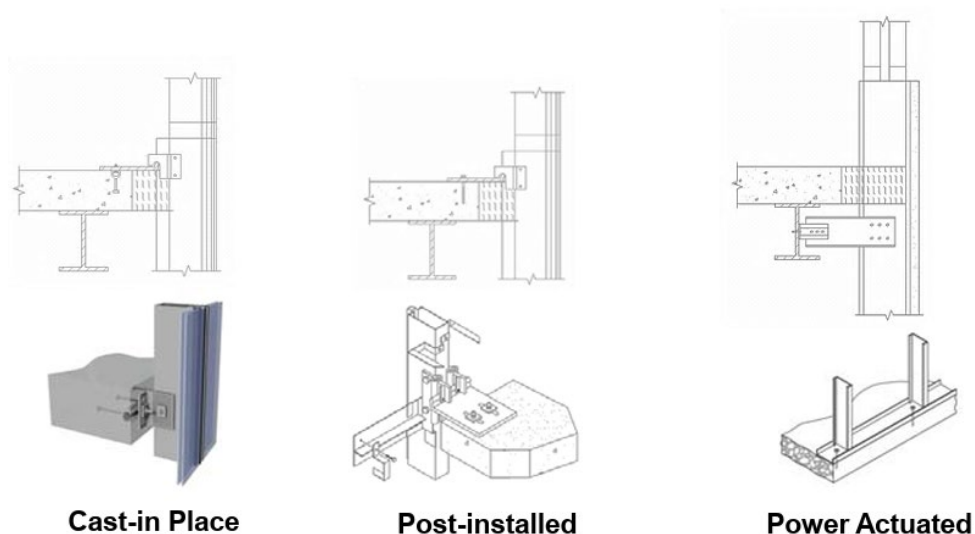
Facade fastening systems in concrete buildings (HILTI, July 2019).
